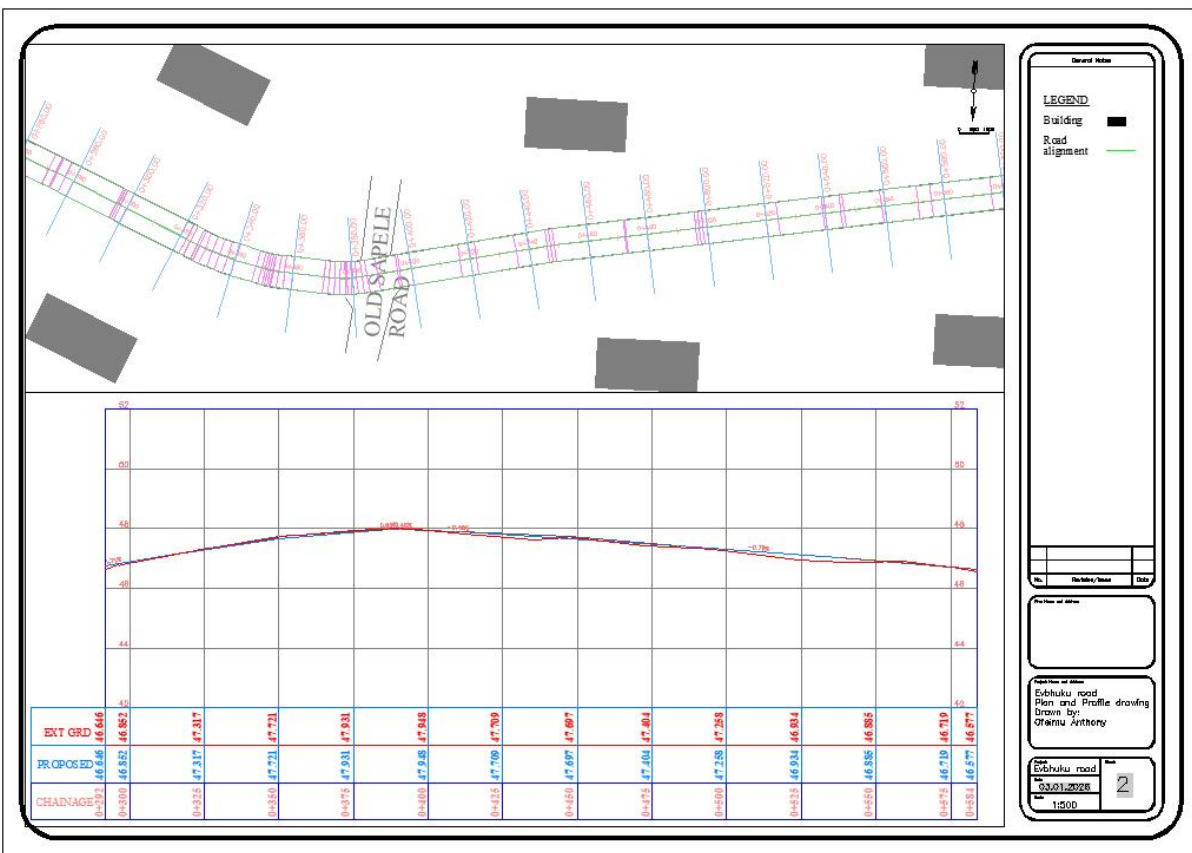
Plan and Profile Drawing (0+292– 0+554)
